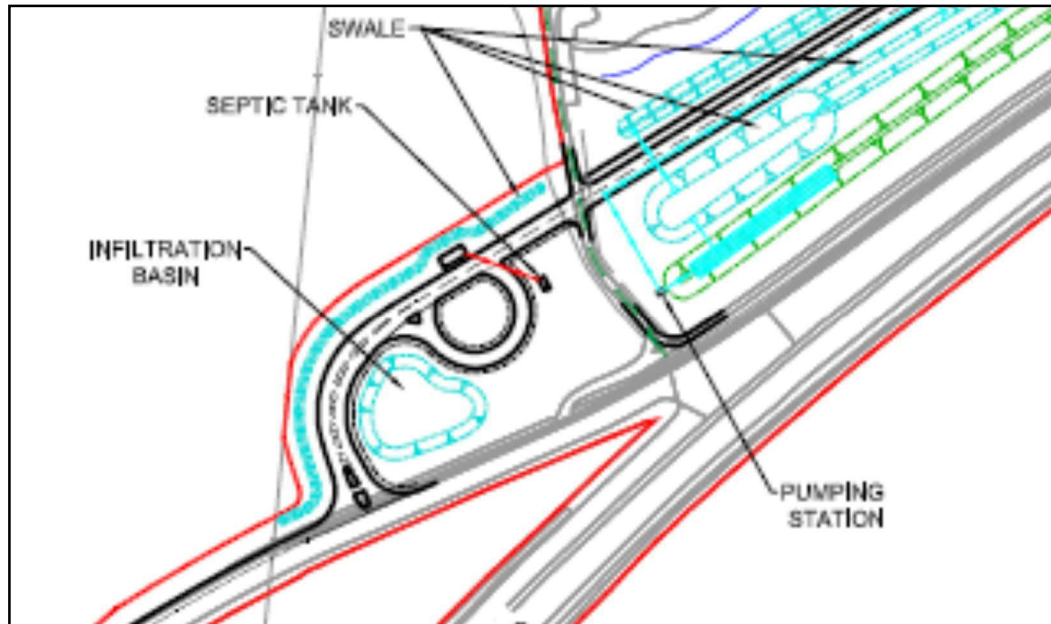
Southern park and ride internal layout showing concept drainage infrastructure to the south
